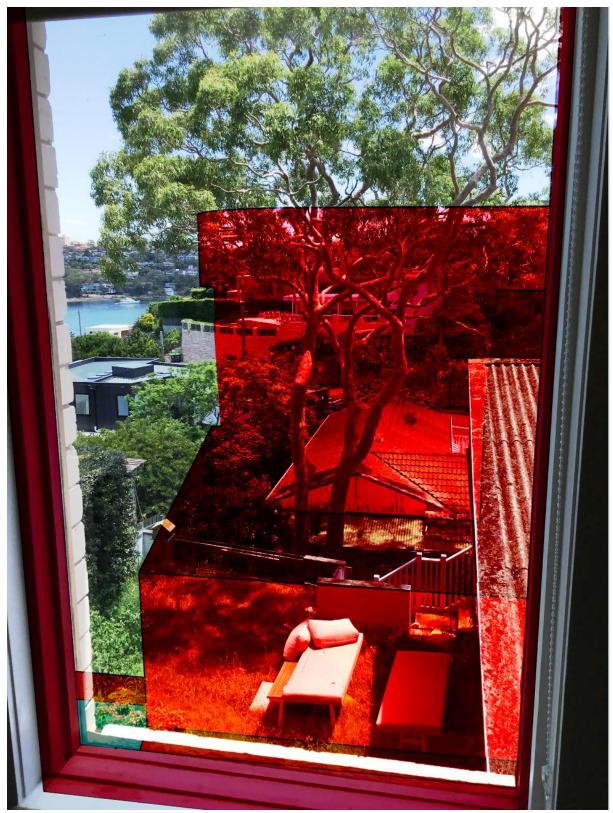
photo from window 5 photomatched to model showing proposed house in red.
